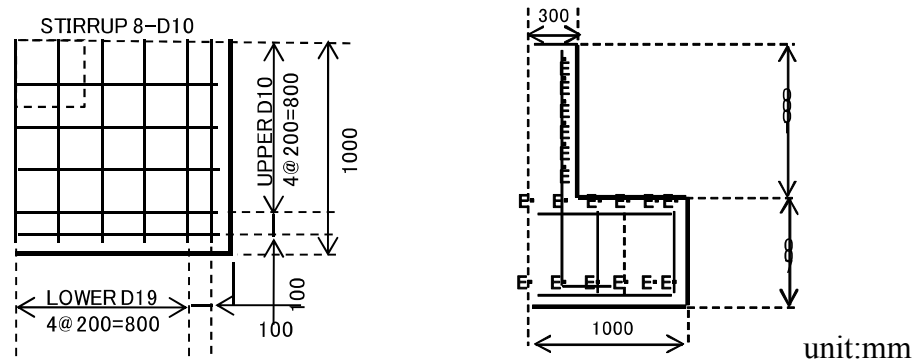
Drawing showing dimensions and bar arrangement of footing models (For Cases 1 and 2. Left: plane section for footing, Right: vertical section)
